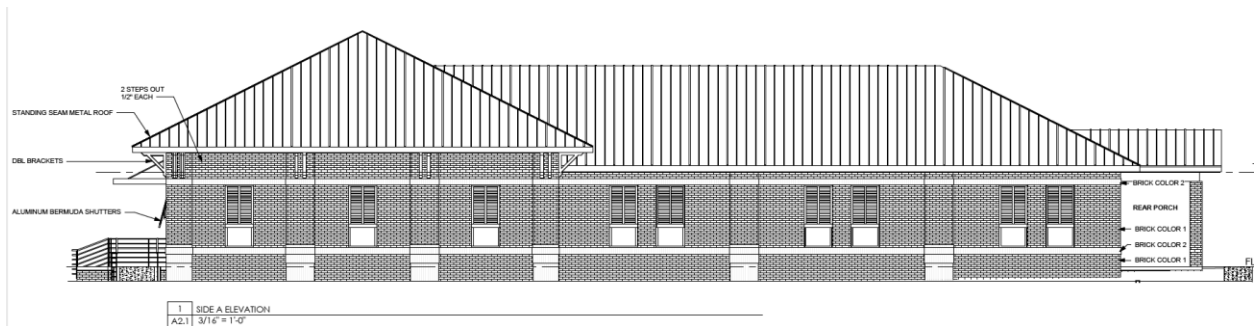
# EXHIBIT D : PROPOSED ARCHITERUAL ELEVATIONS
